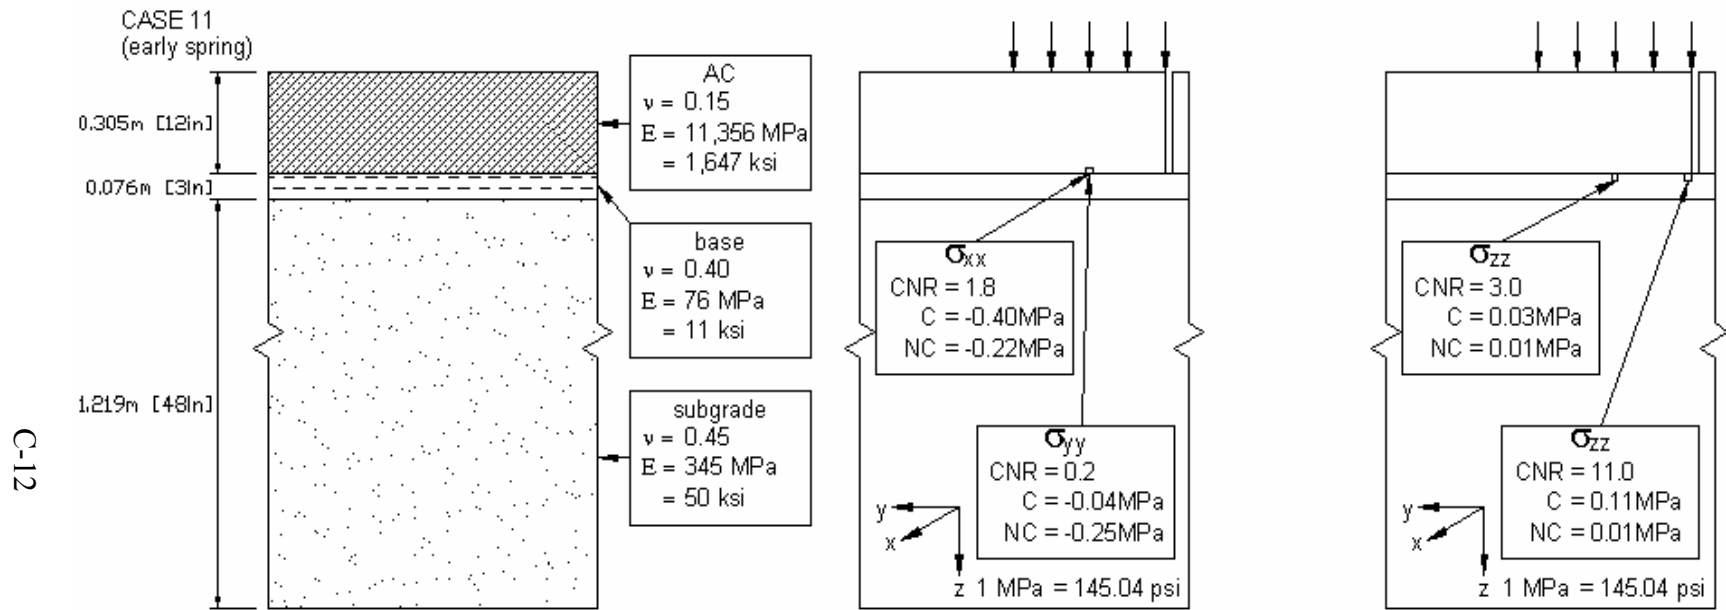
Summary cross section for case 11, (C – stress in cracked pavement, NC – stress in pavement with no crack, CNR – crack/no crack (stress) ratio)
